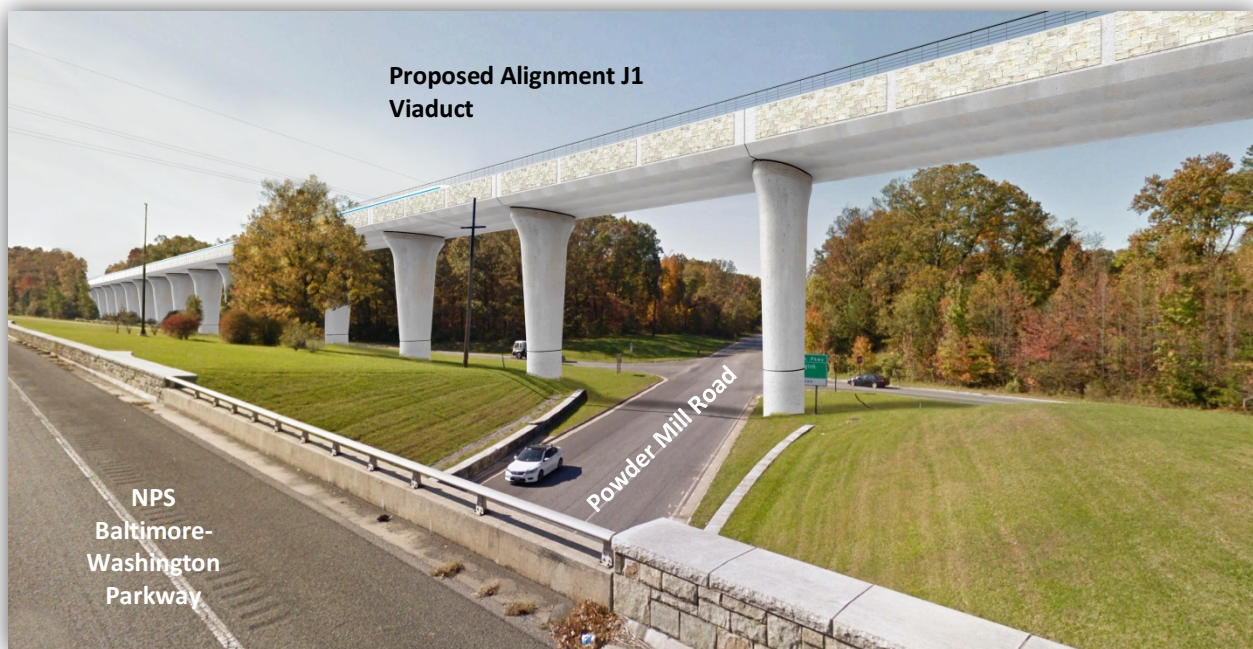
CAA #5 AFTER: Illustrative Rendering of Proposed Alignment J1 Viaduct at Powder Mill Road, Looking Southwest from Southbound BWP at BARC Property
